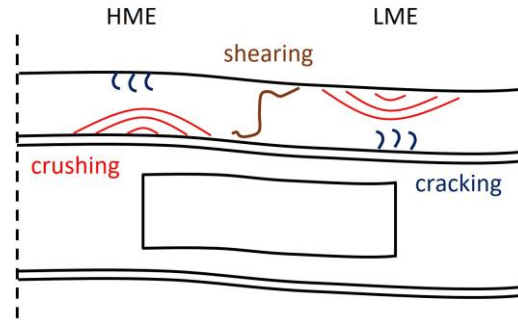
Local stresses within a concrete slab at an opening.
